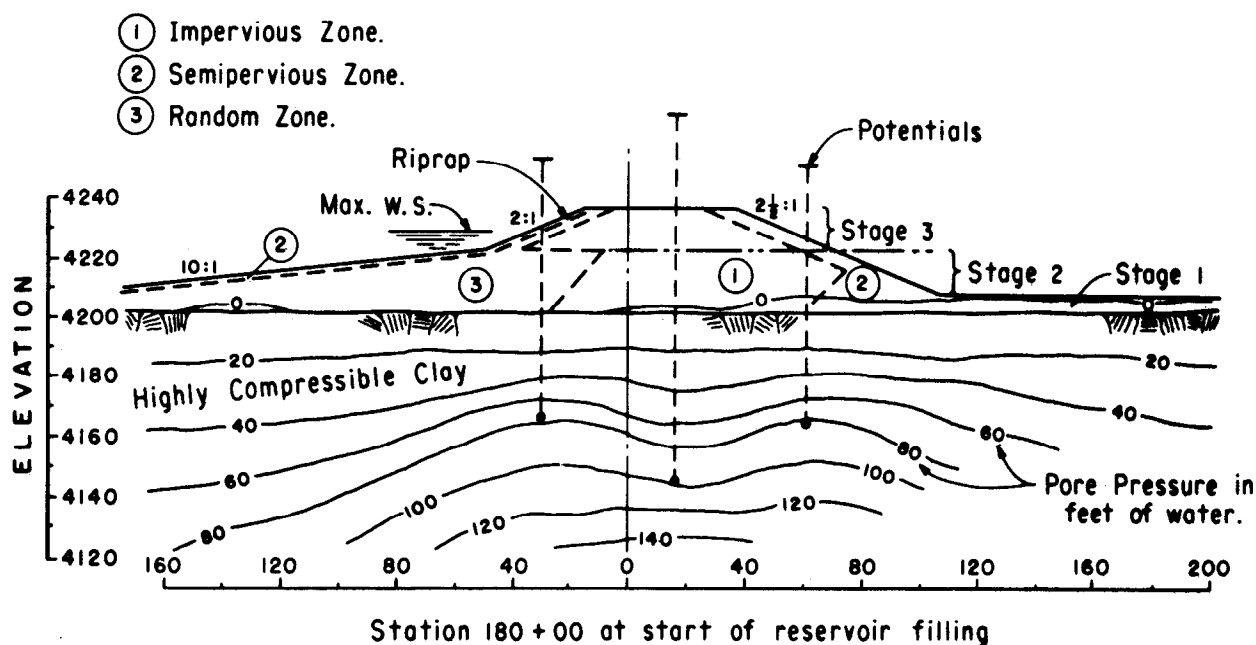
Record of pore pressures in soft foundation soils at end of stage construction, Willard Dam, Great Salt Lake, Utah.
